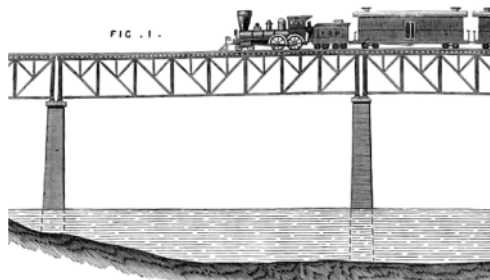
Partial elevation of Juniata River Bridge at Mount Union, PA (adapted from *Engineering* 1871).
